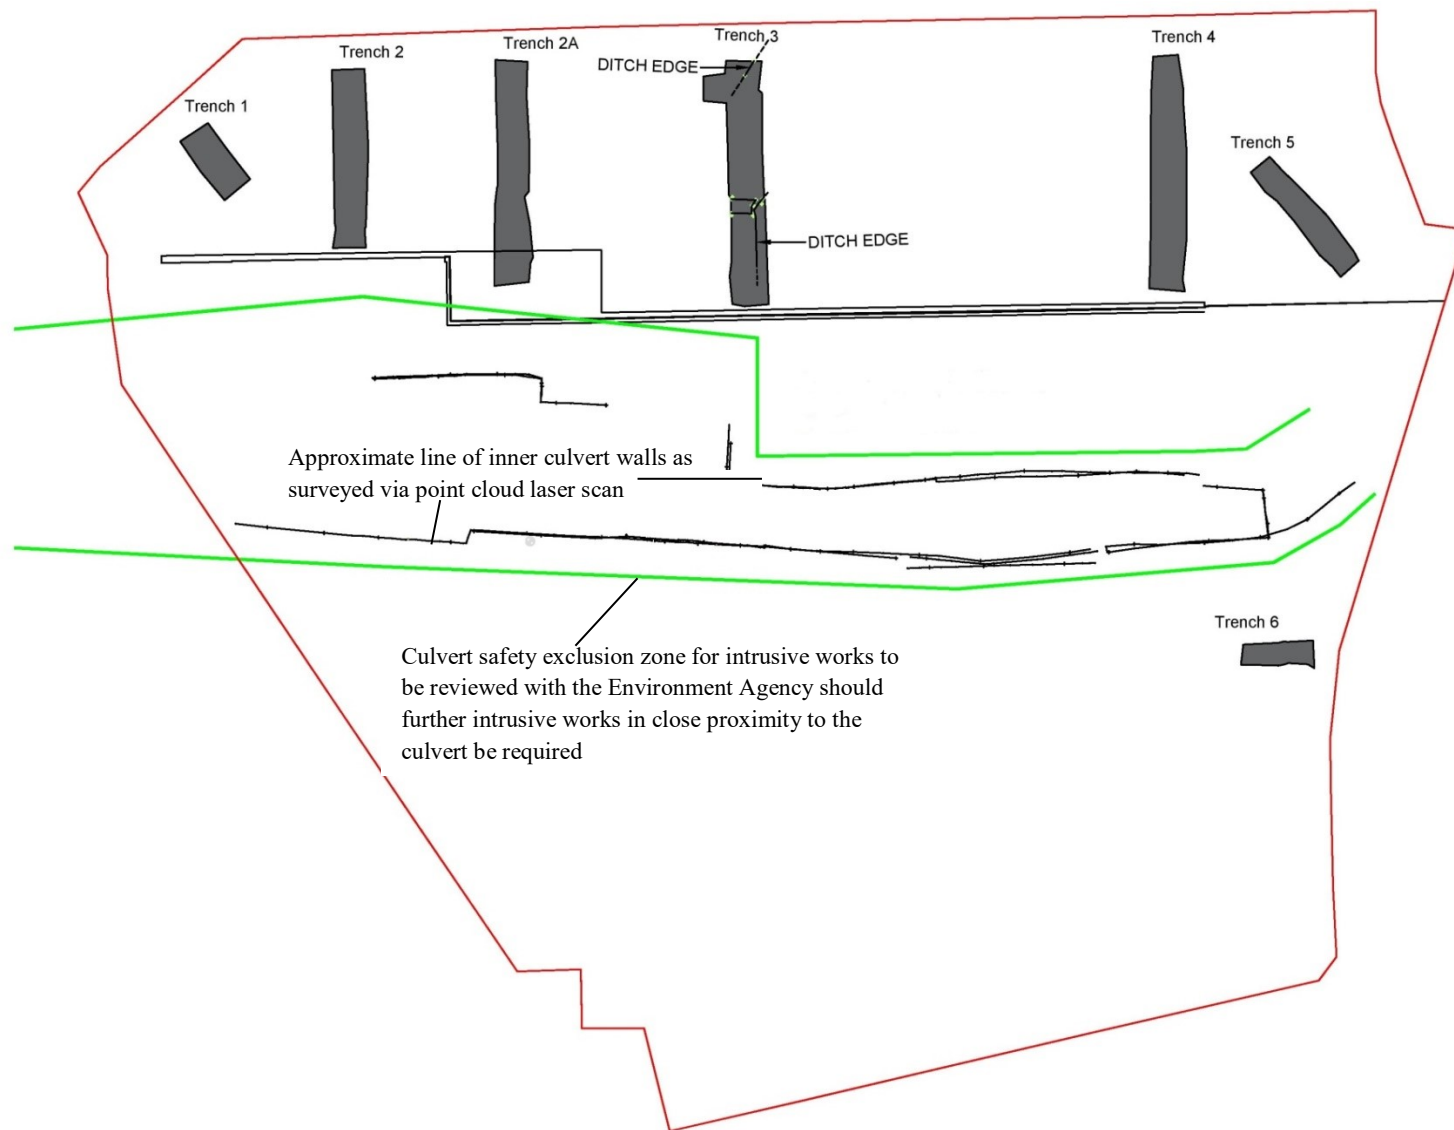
Trench layout Plan. Scale 1:10,000 at A4.
